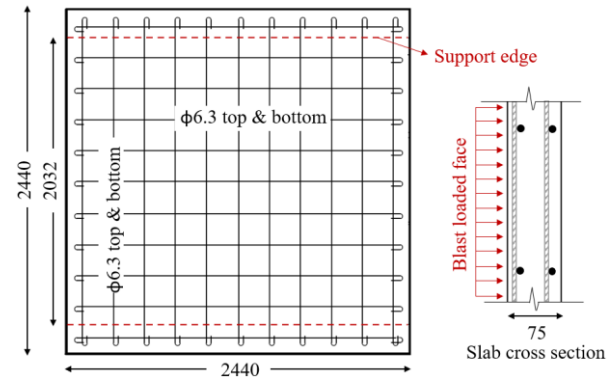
Details of RC slab tested by Jacques (2011) (all dimensions in mm; 1 mm=0.0394 in.)
